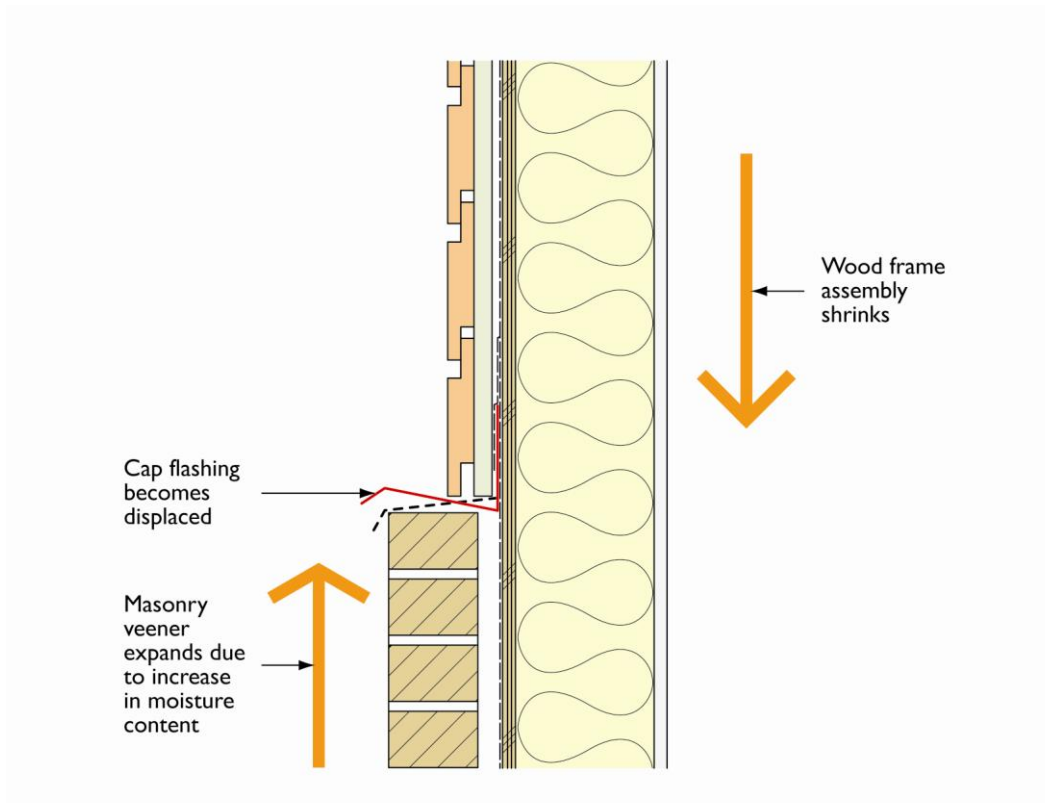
Impact of wood shrinkage at masonry veneer cladding interface with wood siding
